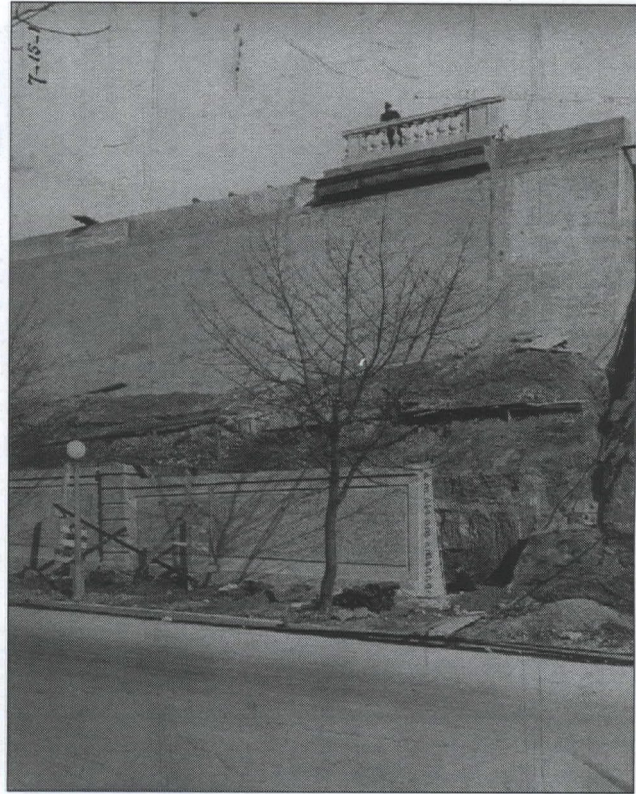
Upper wall along 16th Street during construction. Note balustrade mock-up at top of wall. Also note how the extreme change in topography along 16th Street was dealt with by constructing two smaller retaining walls. The area between the two walls was heavily planted to reduce their visual impact. (RCP-CRF, c. 1915-1916).
